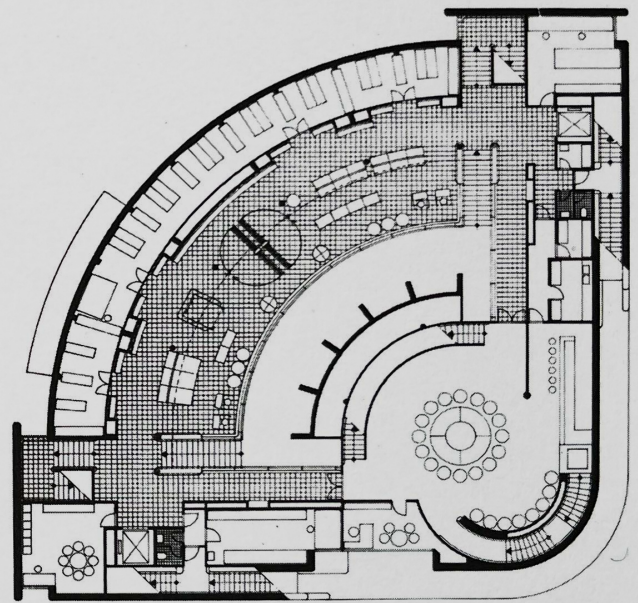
1st floor plan (Source: Väljas & Karu, 2012, p. 50)
